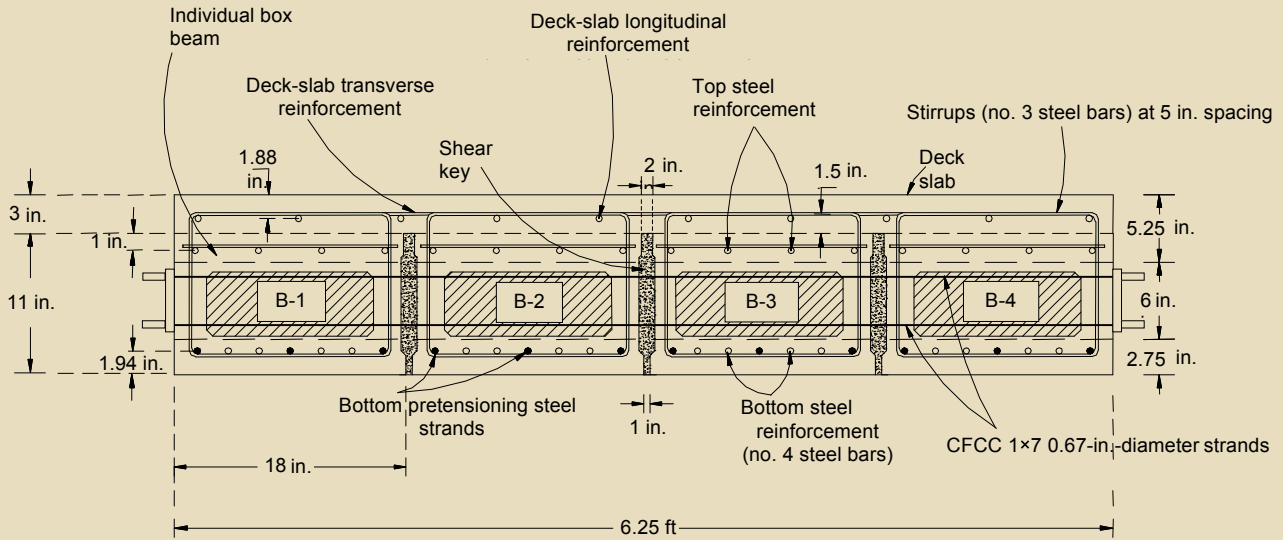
This drawing illustrates the cross section of the bridge model. Note: 1 in. = 25.4 mm; 1 ft = 0.305 m; no. 3 = 10M; no. 4 = 13M.
